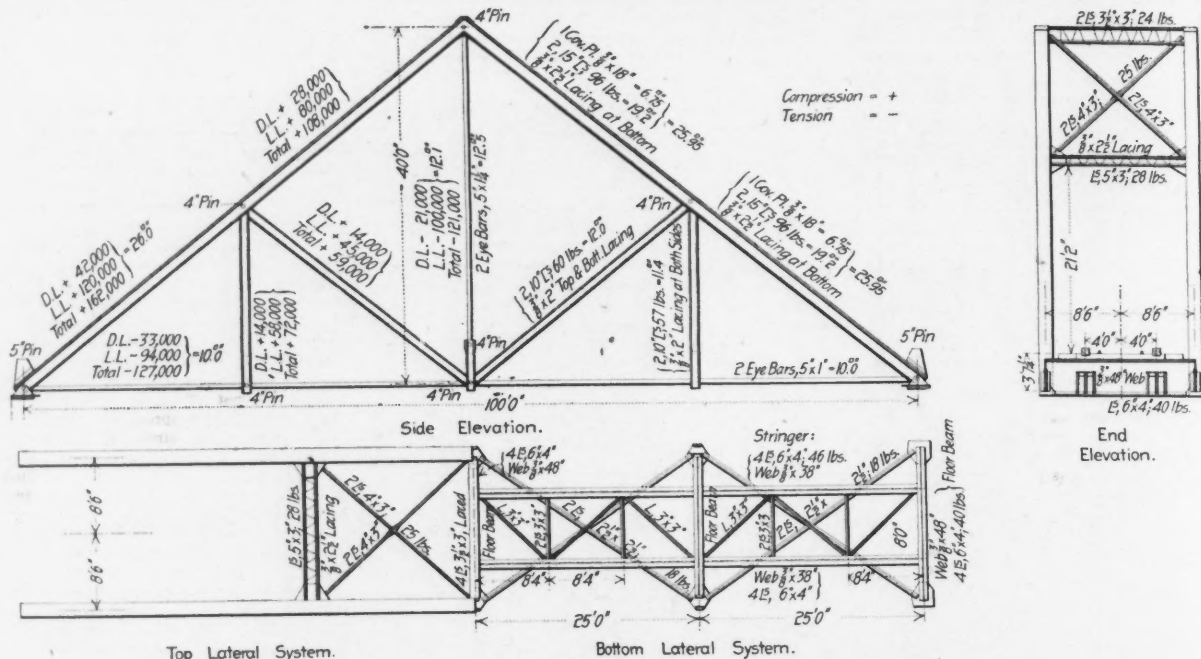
WADDELL'S PATENTED "A" TYPE OF THROUGH TRUSS FOR SHORT SPANS.
